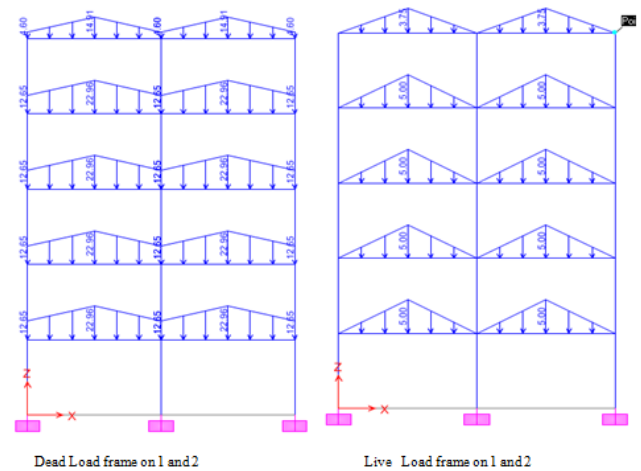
Dead Load and Live Load on Frame 1 and 2
